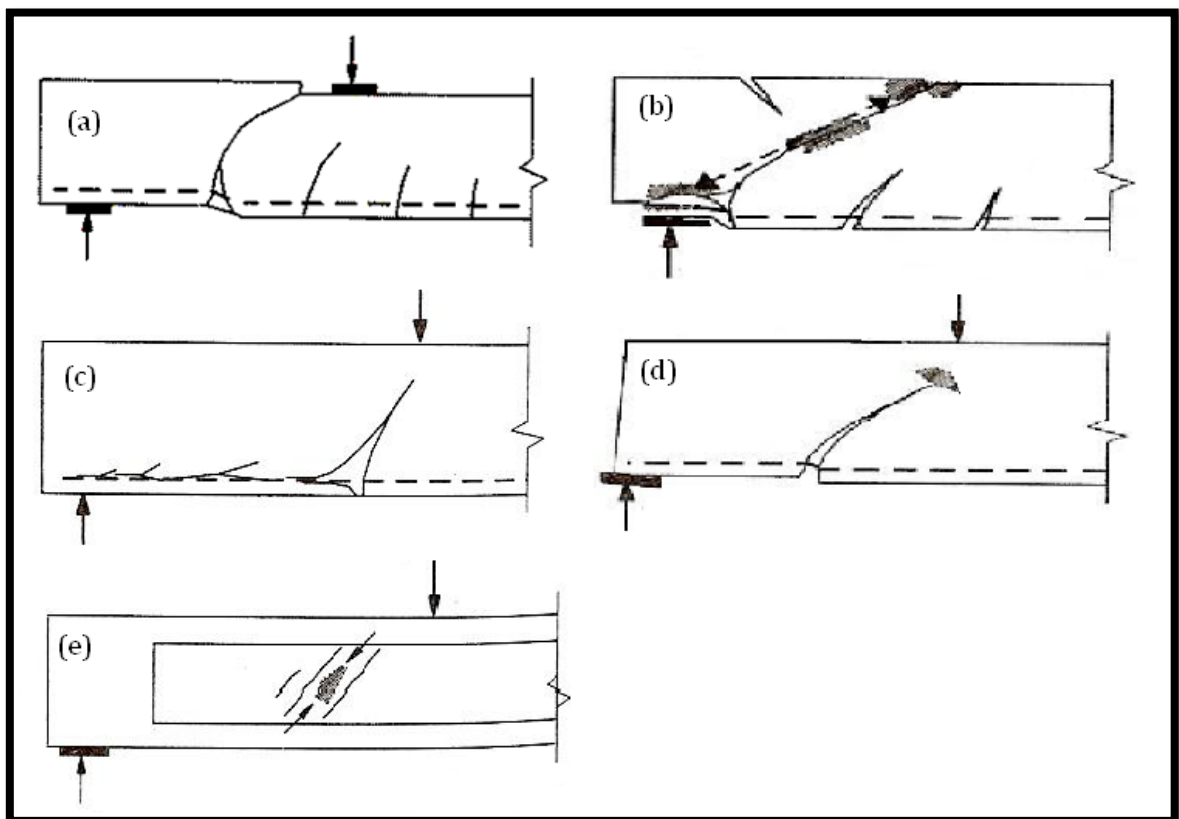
Modes of failure: (a) diagonal tension failure, (b) shear compression failure, (c) Shear tension failure, (d) arch rib failure and (e) web crushing failure (Amlan et al, 2011).
